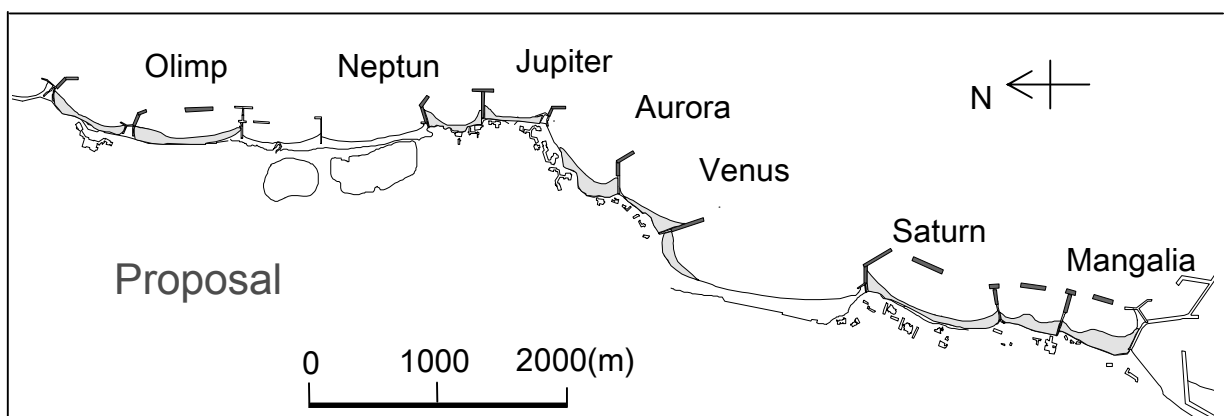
Proposed shore protection facilities at Mangalia Sector
